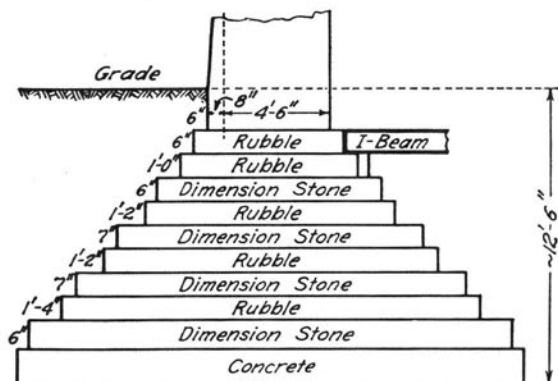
SECTION THROUGH EXTERIOR PIER
